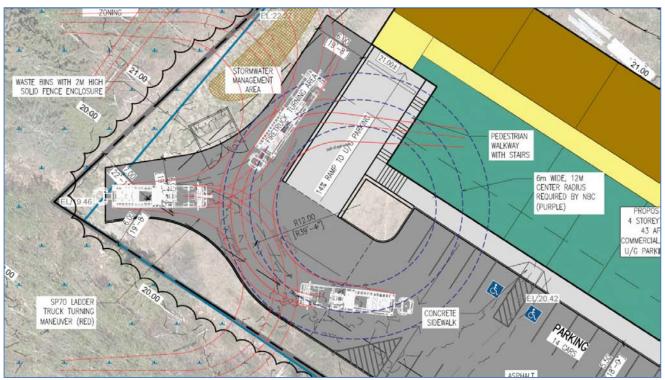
Revised Site plan with Turning Area for Fire Trucks
